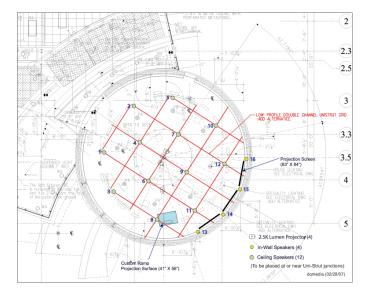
Were the House Still Standing: Maine Survivors and Liberators Remember the Holocaust, reflected ceiling plan of the installation.
